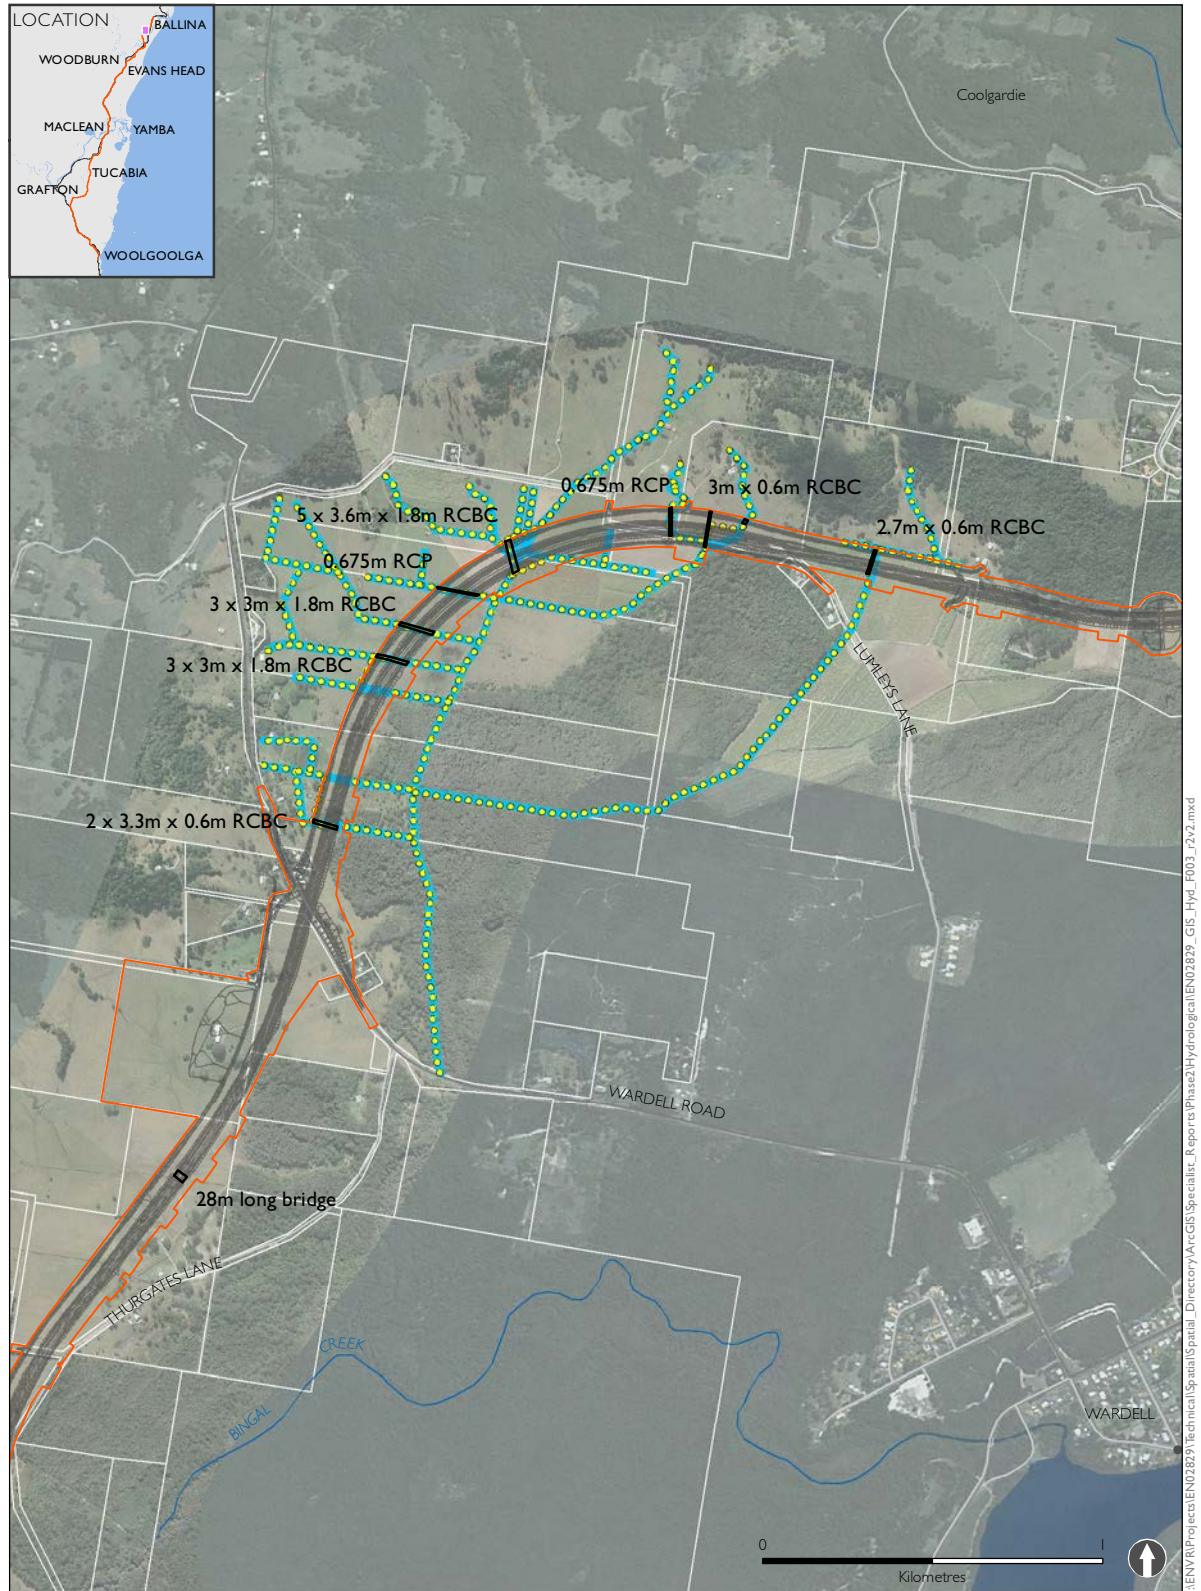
Proposed cane drainage diversions north of Tuckombil Canal (Section 8)
